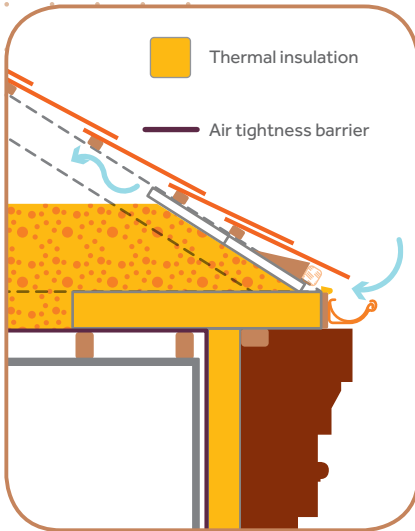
IWI solution at the junction of wall and ceiling to ensure continuity of the insulation and air barrier while providing adequate loft ventilation at the eaves.
